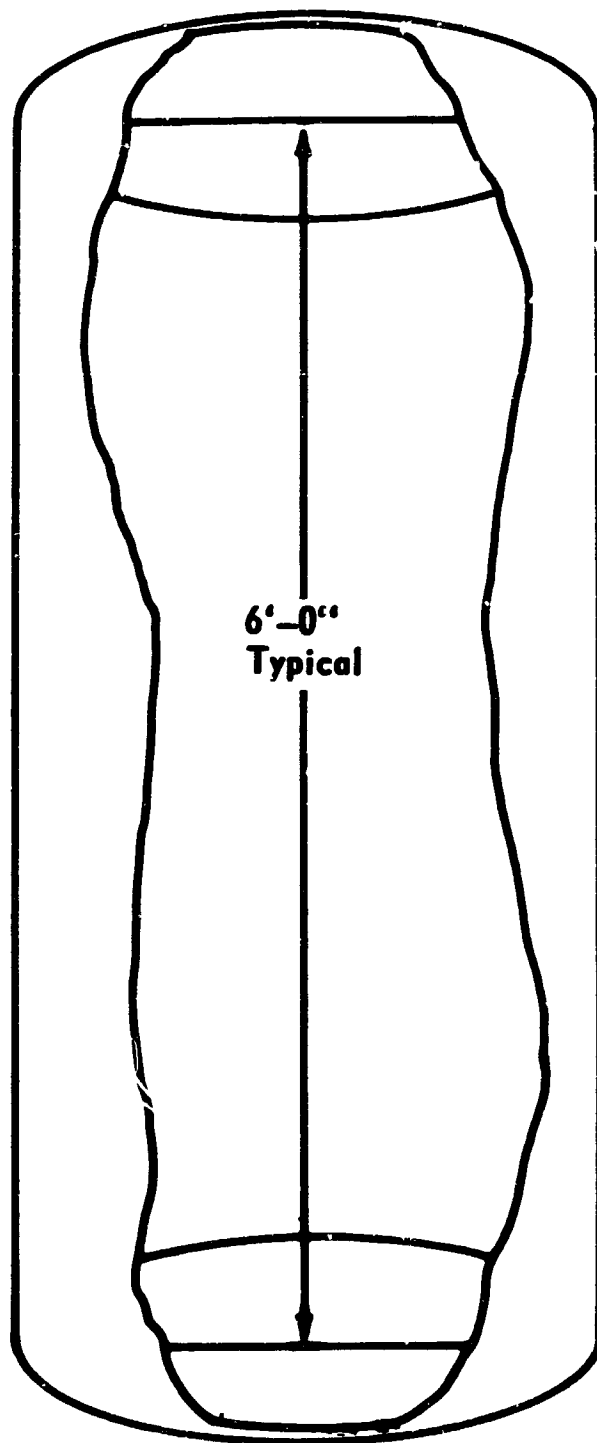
Basic Geometric Configurations - Minimum Clearance Dimensions
